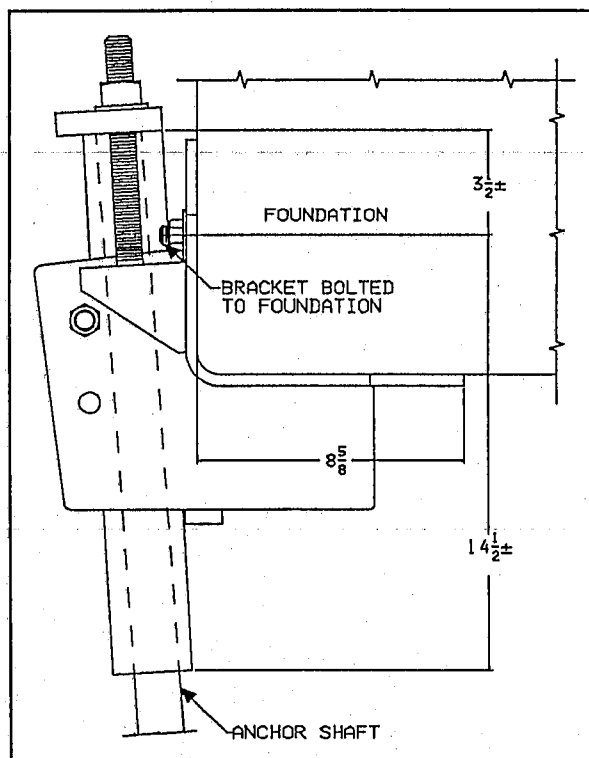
Bracket Installed on Foundation & T-Pipe on Anchor
